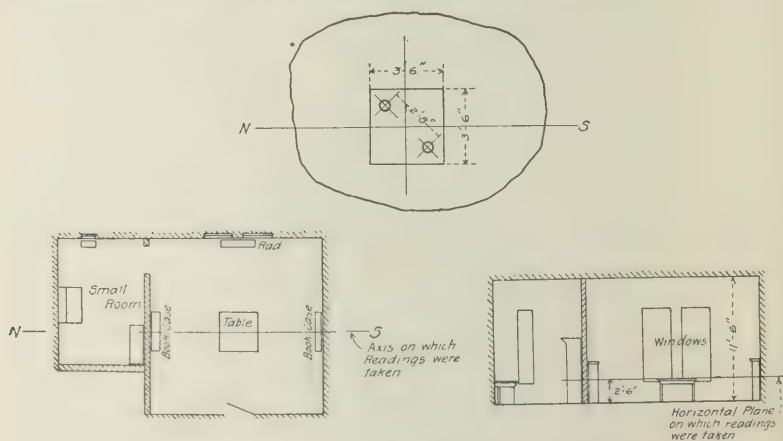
Plan and elevation of room, and center view showing position of lamps.
